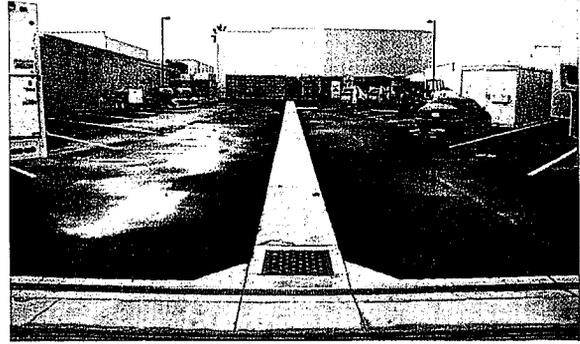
Paved parking surface . Note: Trench drain connects to drain box.
